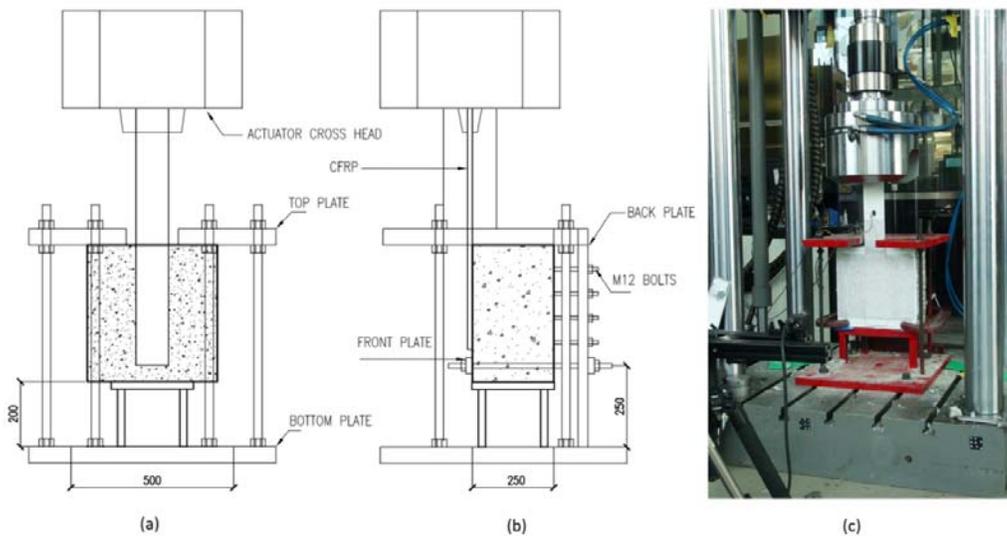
Specimen testing rig details (a) configuration of test rig (front view); (b) configuration of test rig (side view); (c) Photo of specimen inside testing rig
